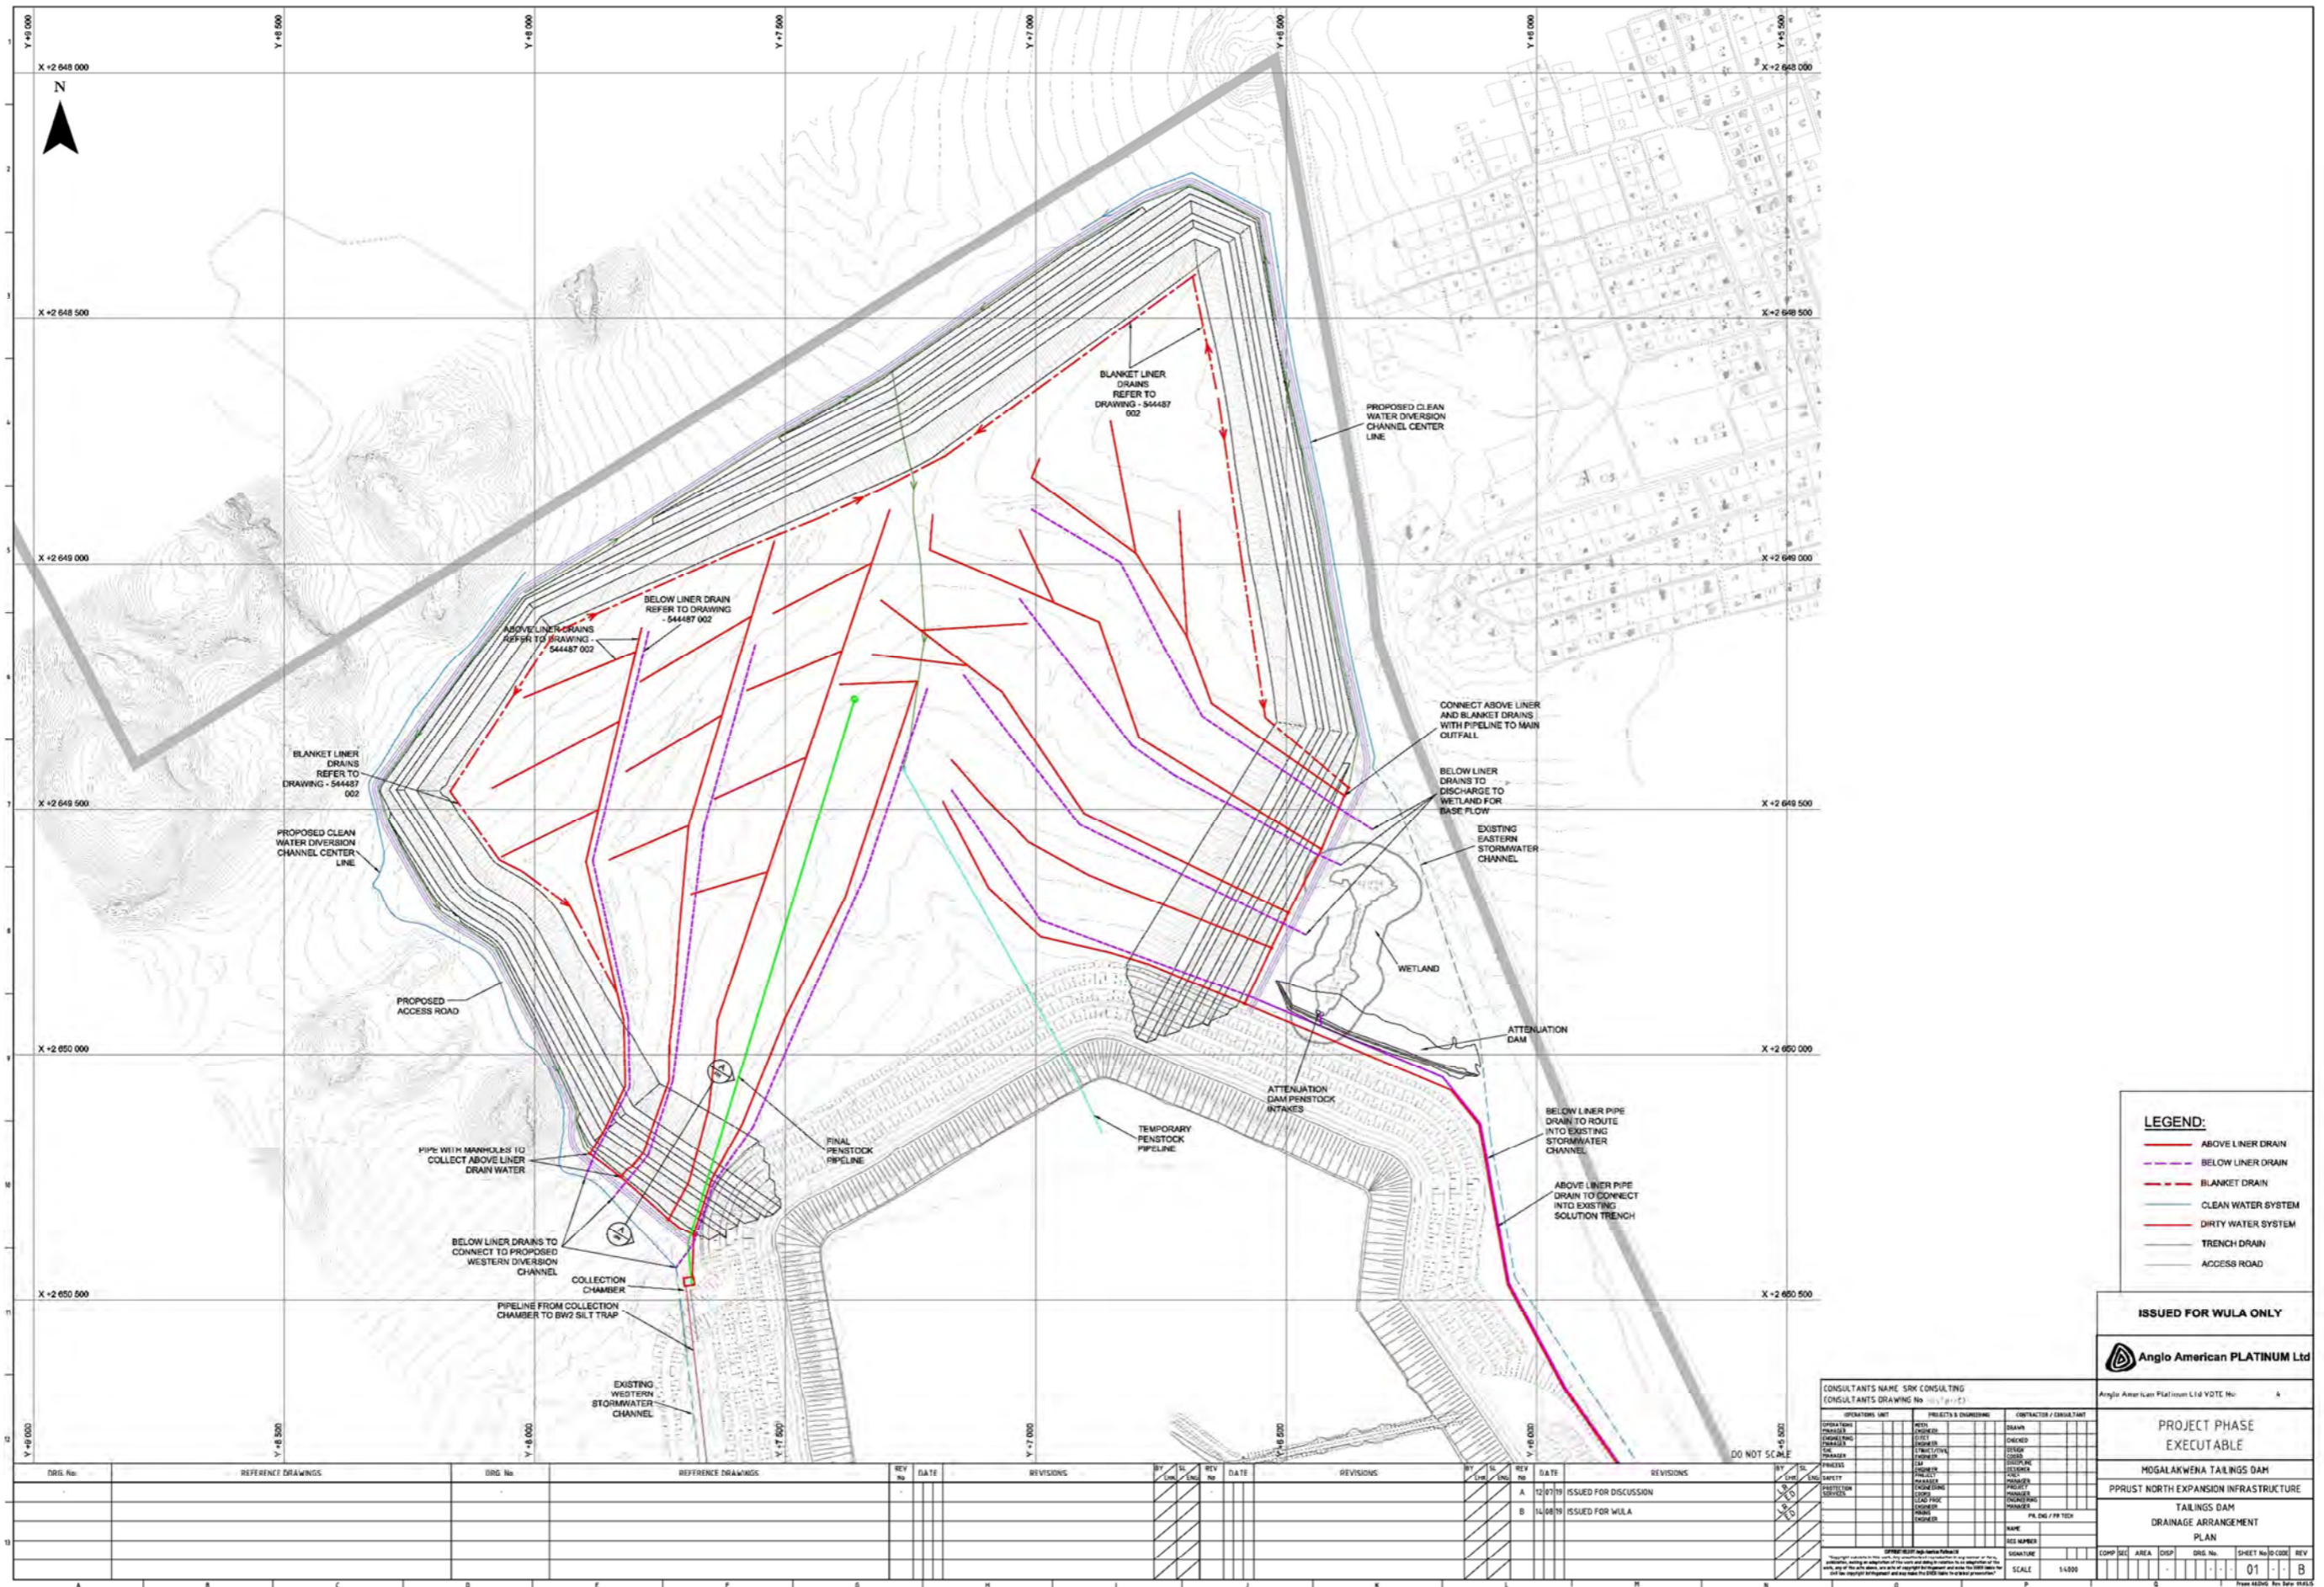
Proposed layout of the Blinkwater 2 expansion TSF
